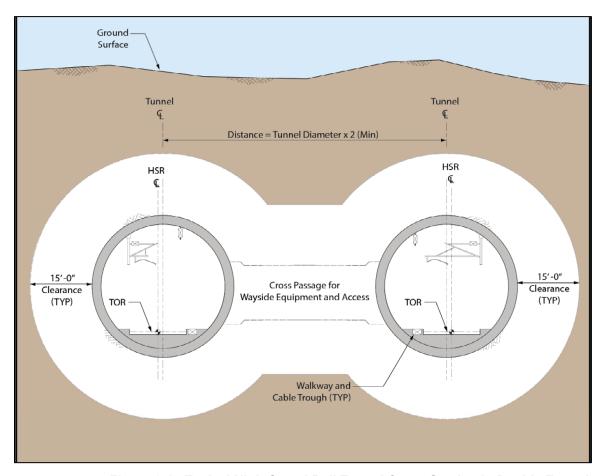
Typical High-Speed Rail Tunnel Cross Section in Double Tunnel
